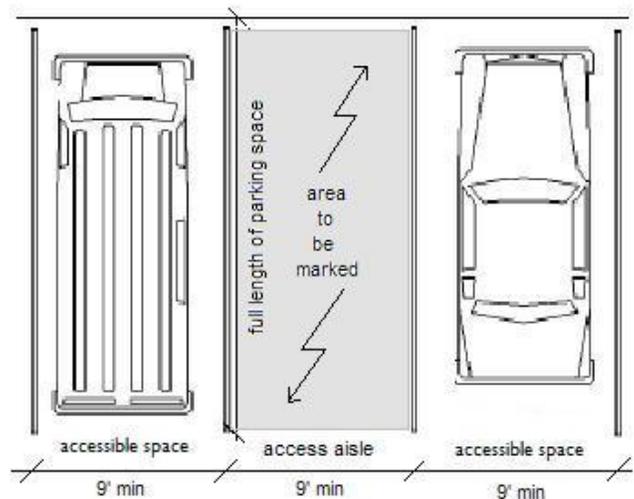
F.7: Accessible Parking Space and Access Aisle Dimensions
